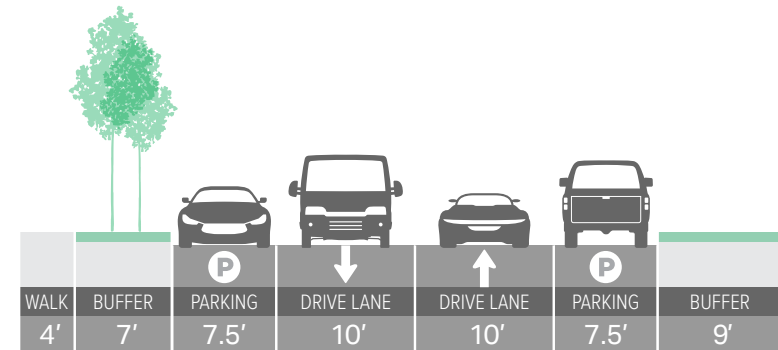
Existing Cross-Section Crockett Street to Spring Street
